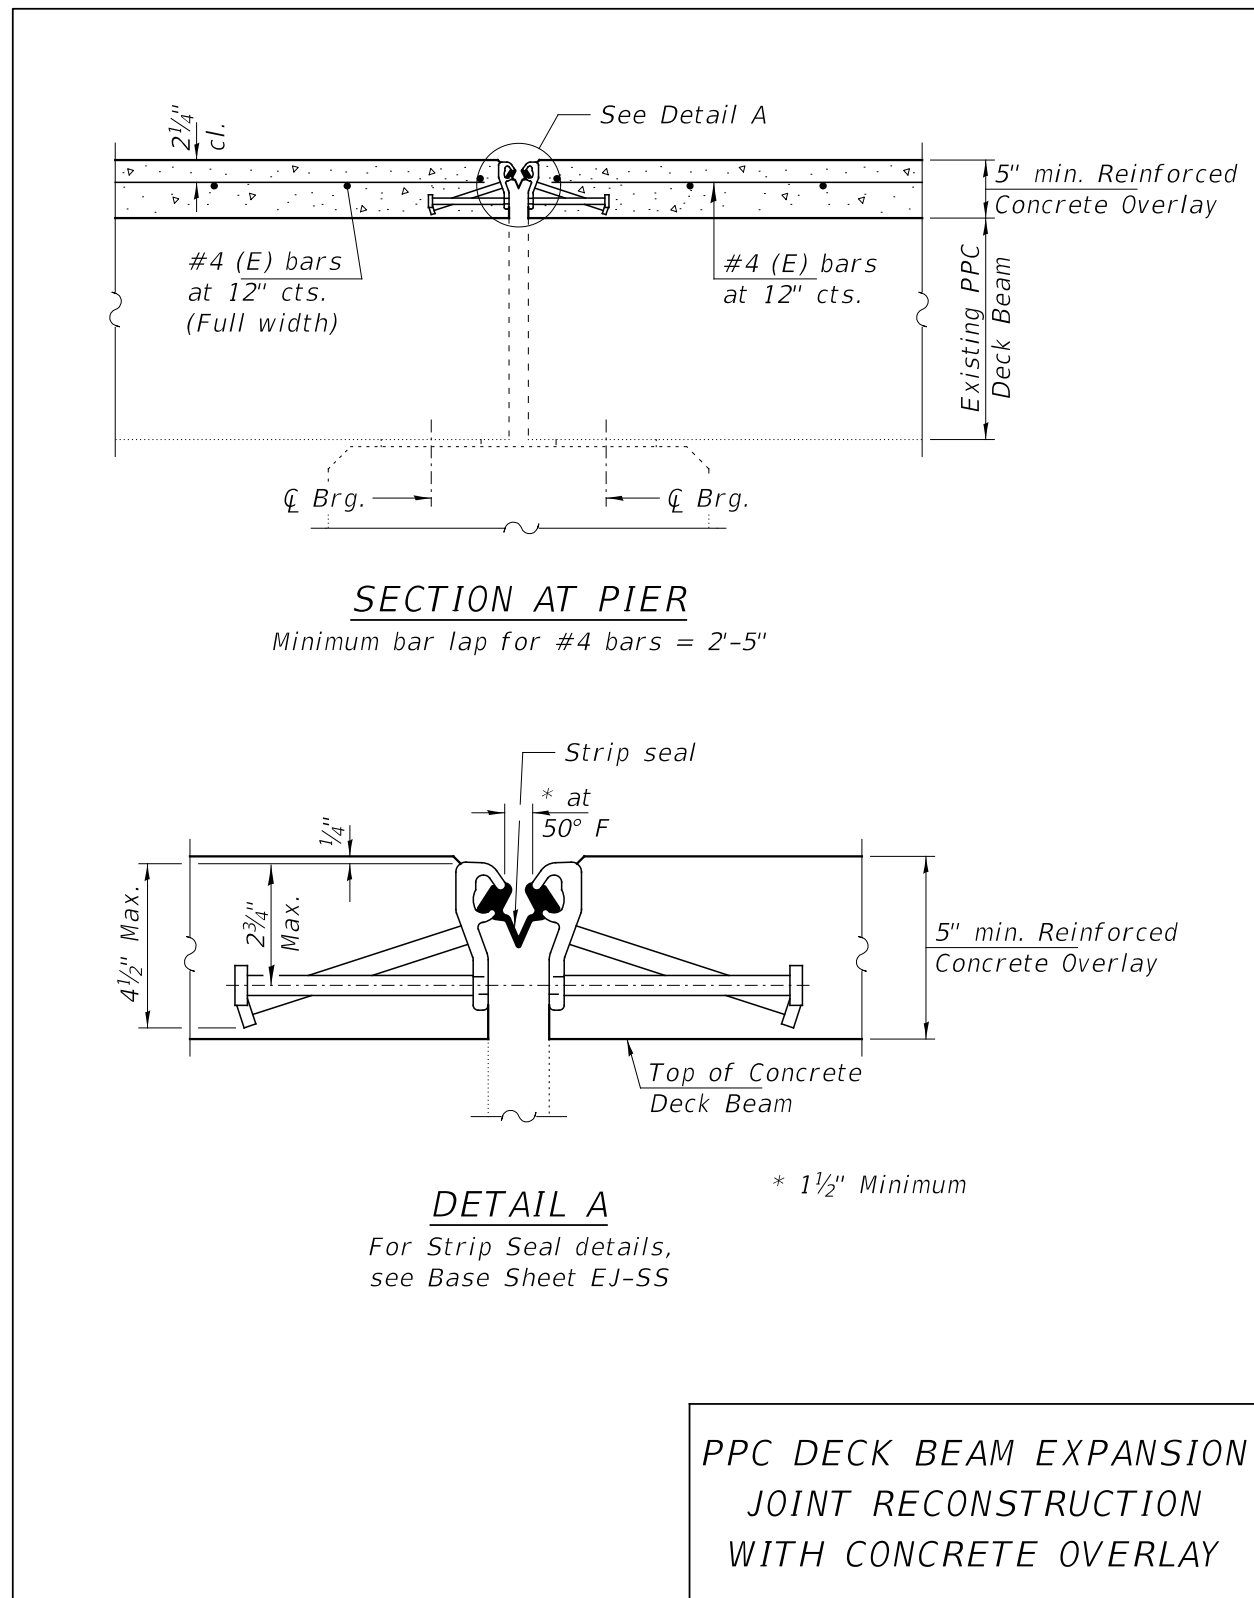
PPC Deck Beam Expansion Joint Reconstruction with Concrete Overlay
